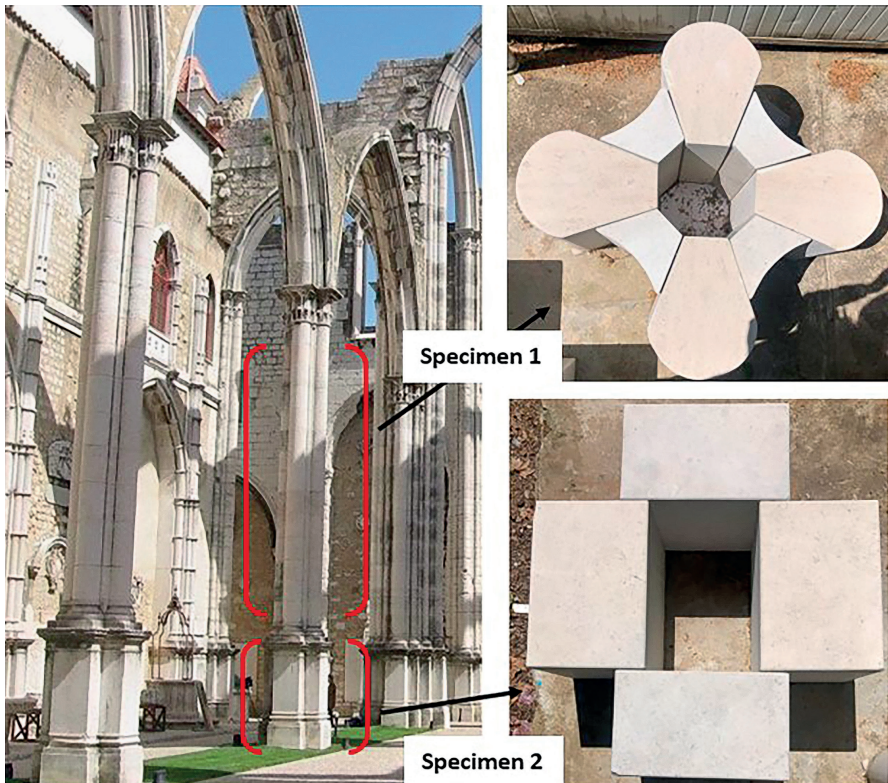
Lab test specimens replicas of different parts of existing piers: (1) shaft cross-section; and (2) pedestal cross-section.
